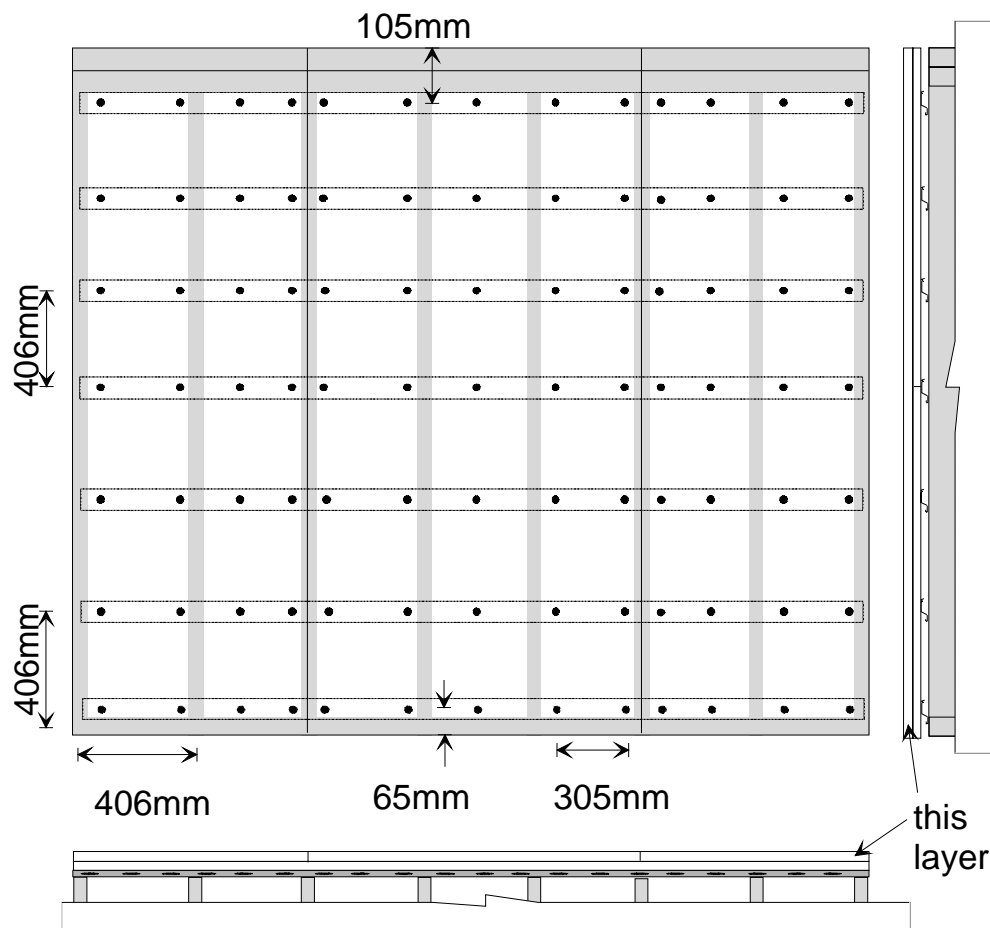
Face-ply of two-ply gypsum board attached perpendicular to resilient furring channels. Resilient channels attached perpendicular to studs at 406 mm o.c.. Studs at 406 mm o.c., double plate at top, single plate at bottom. Meets requirements of CAN/CSA-A82.31-M91, Clause 12.2.3.1. Note that screw spacing was shifted from ideal locations to avoid contact with studs. Drawing not to scale.
